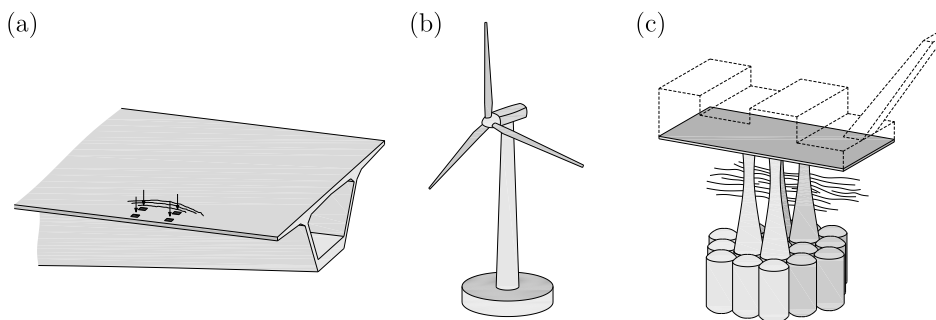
Examples of structural elements potentially sensitive to shear-fatigue failures: (a) bridge deck slabs; (b) wind towers; and (c) offshore platforms
